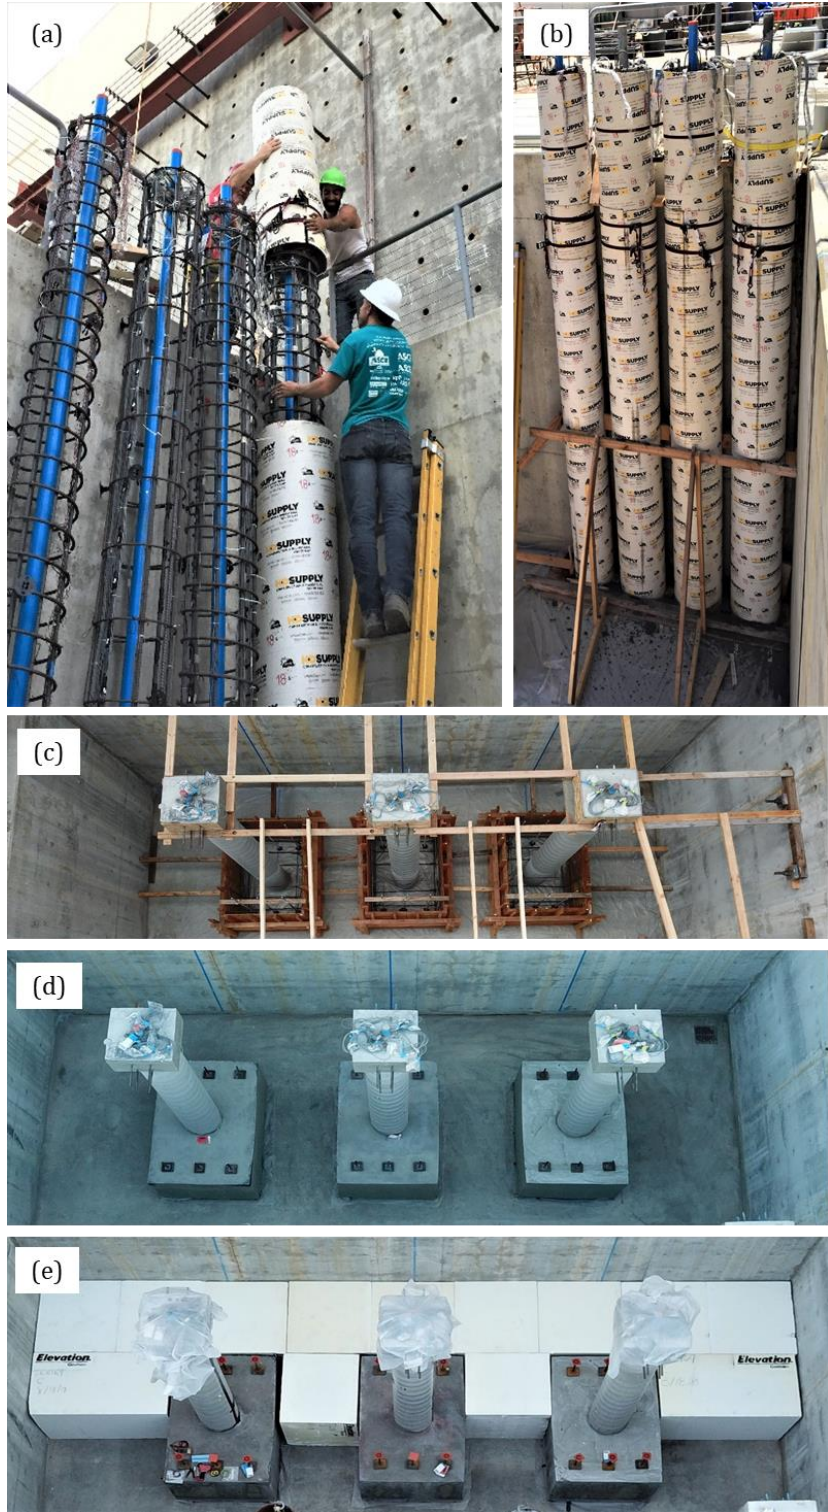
(a) Instrumented specimens prior to concrete pouring, (b) Shafts braced to the wall prior to concrete pouring, (c) Concrete shafts placed in rock-socket formwork, (d) Specimens with rock-sockets anchored into the floor (e) Geofabric blocks in place
